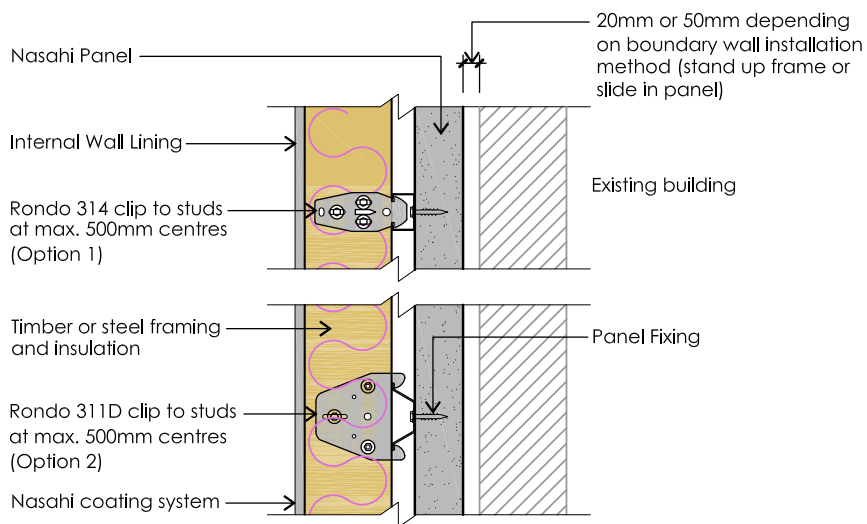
External Wall Fixing (Allotment Boundary Wall)
